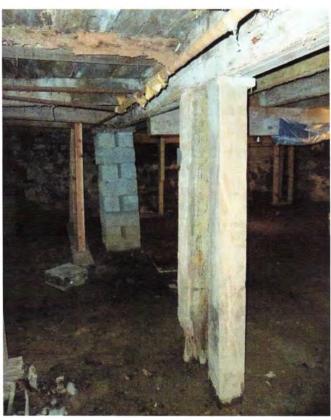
General view of first floor framing and the girders, posts, and piers that support the first floor framing. Most, if not all of the first floor framing is severely deteriorated.
